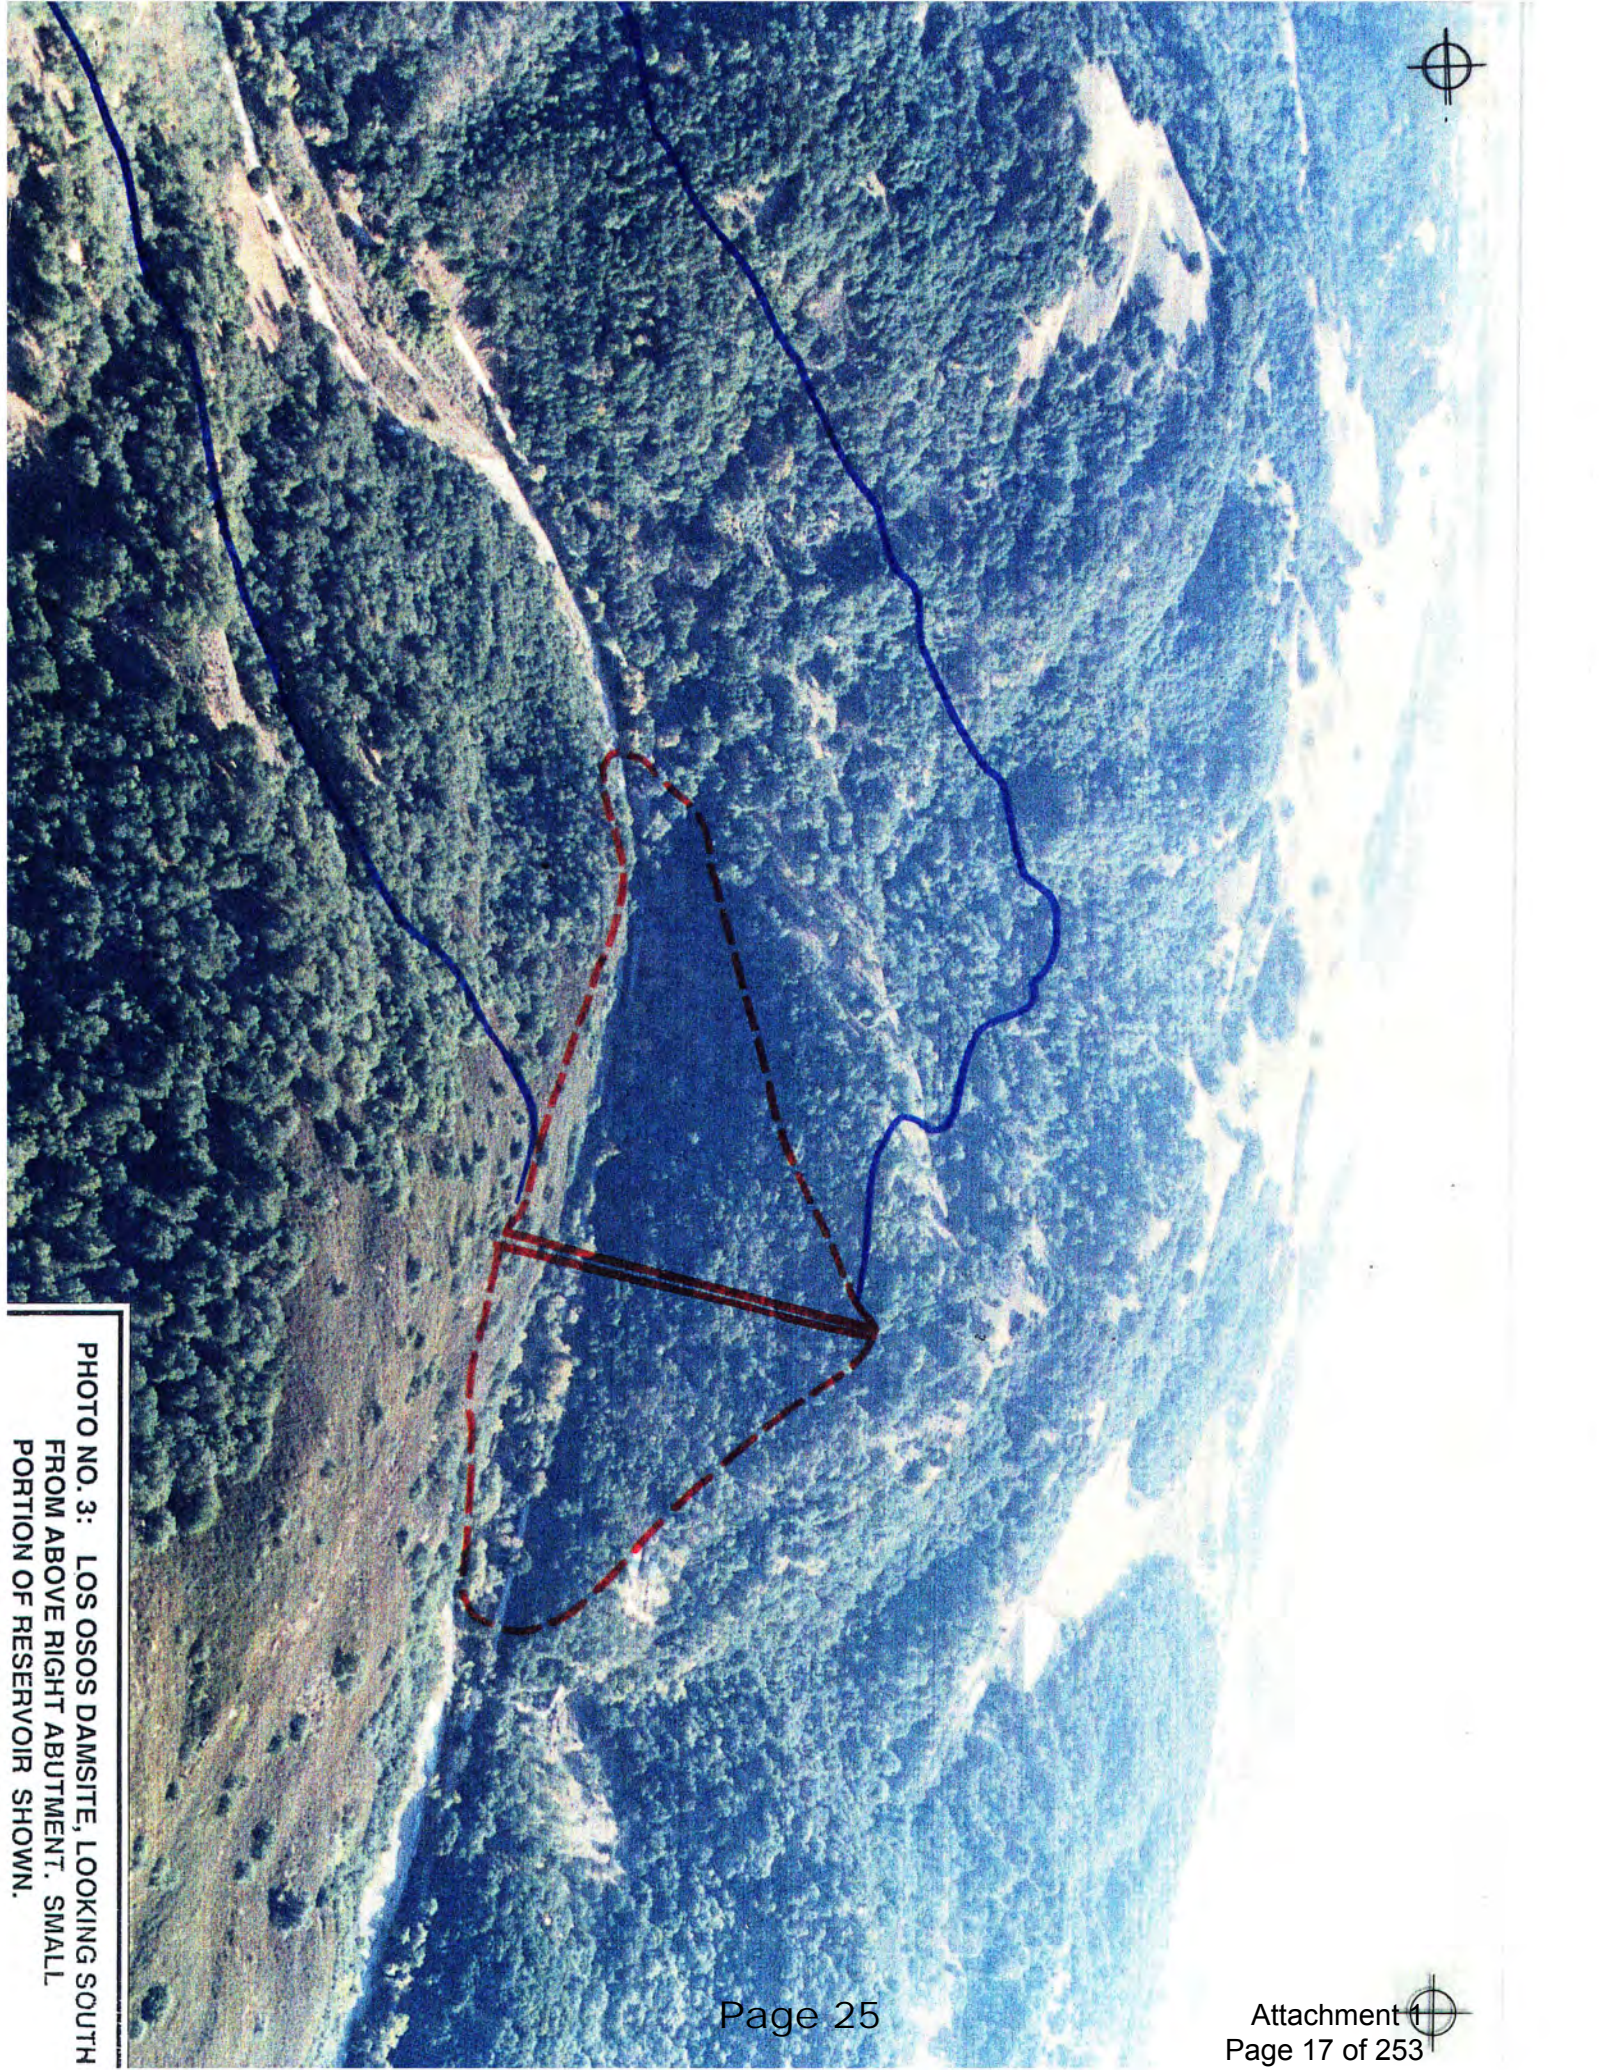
LOS OSOS DAMSITE, LOOKING SOUTH
